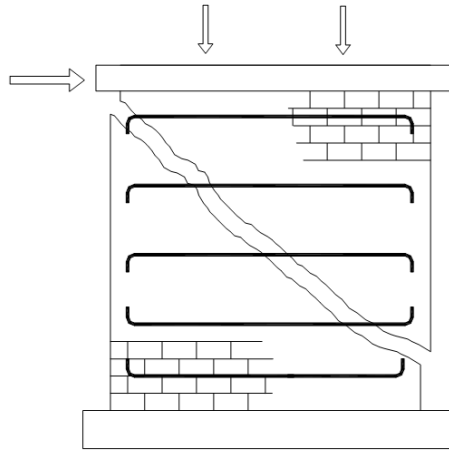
Role of horizontal reinforcement in resisting masonry shear failure (Voon 2007)
